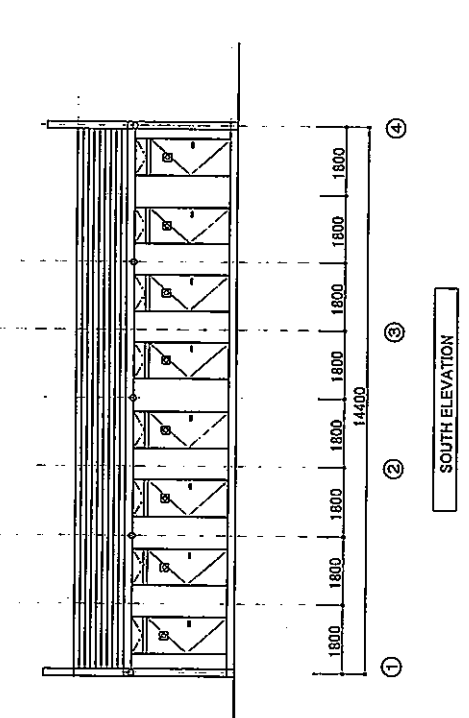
Plan, Elevation and Section of Fishermen's Lockers (2)
